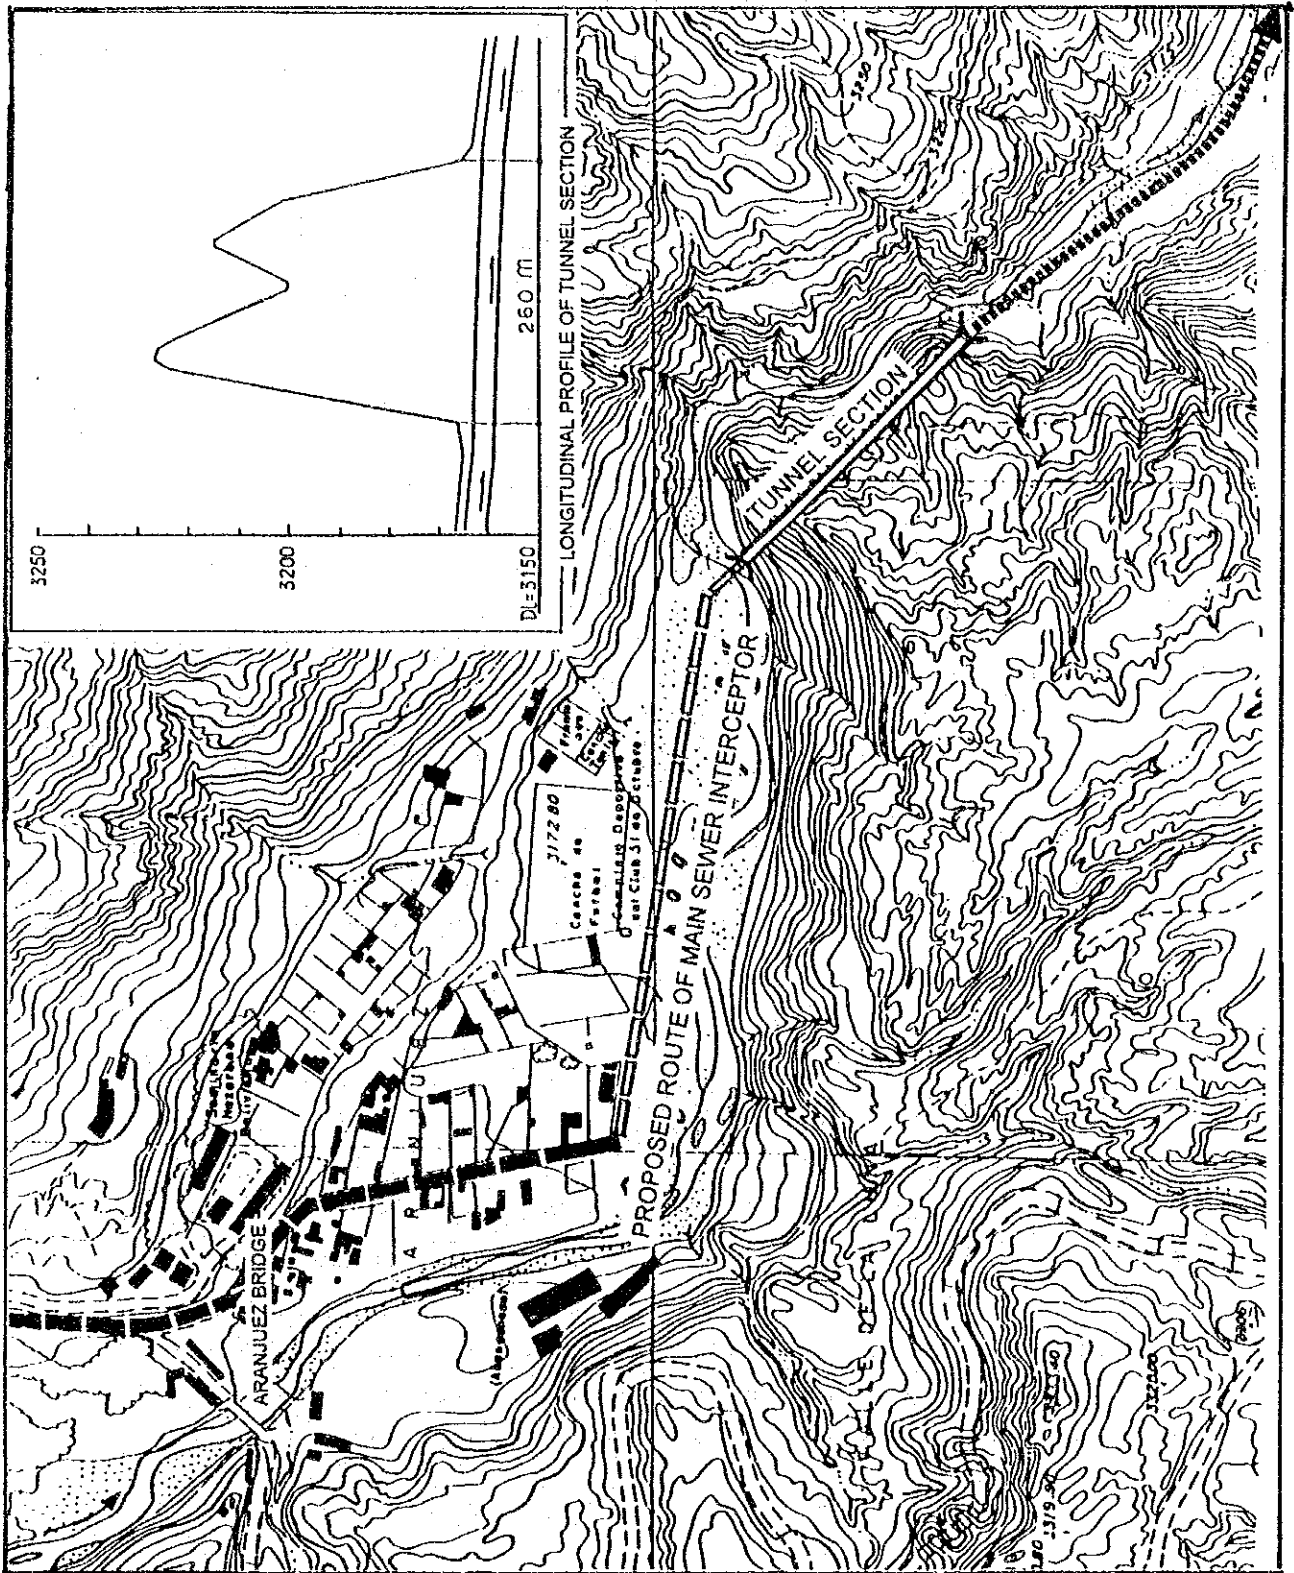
Plan and Longitudinal Profile of the Proposed Tunnel for Main Sewer Interceptor
